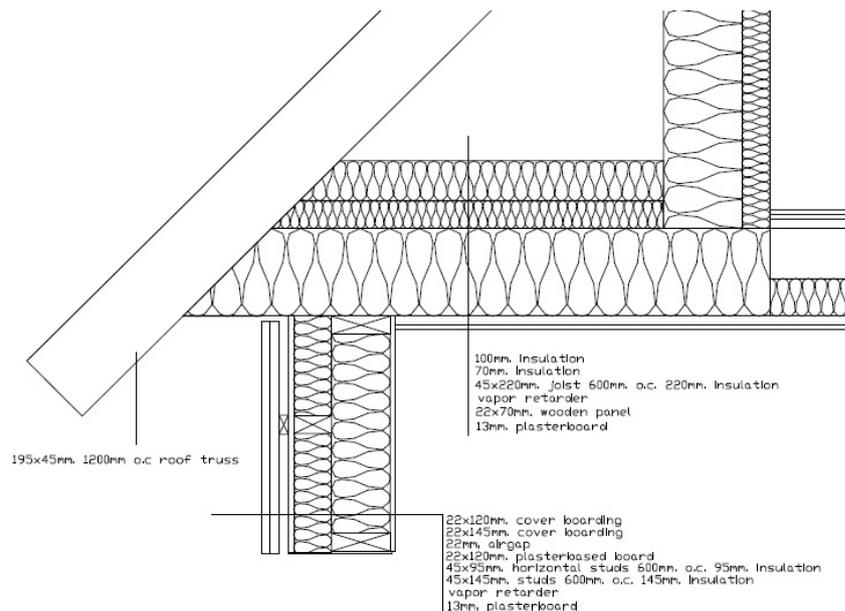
Swedish Type-house roof- and joist-floor constructions.
